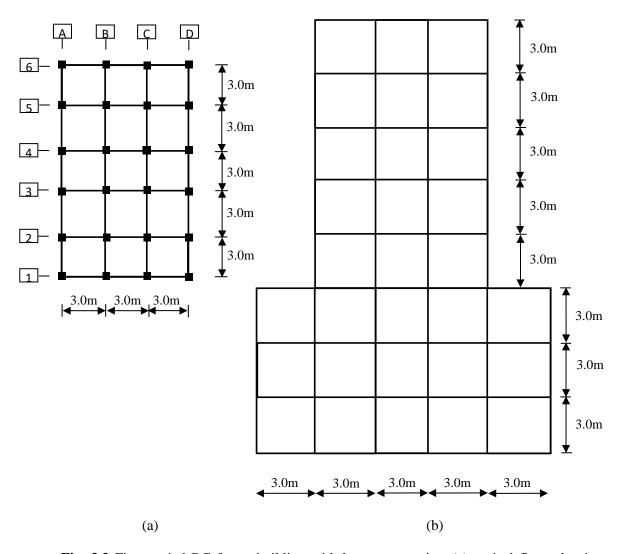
Five-storied RC frame building with basement stories: (a) typical floor plan in superstructure and (b) elevational view.
